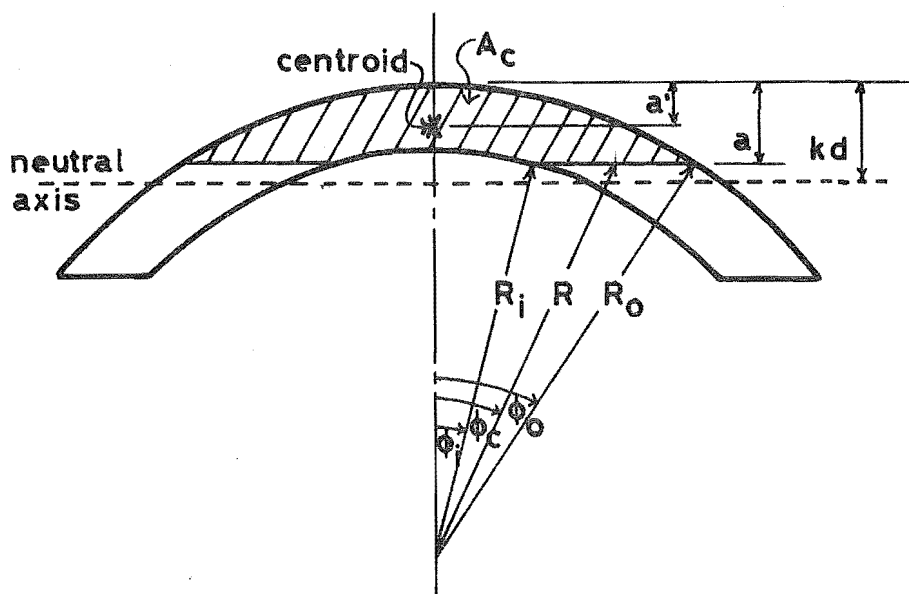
CONCRETE COMPRESSION BLOCK NOTATION
